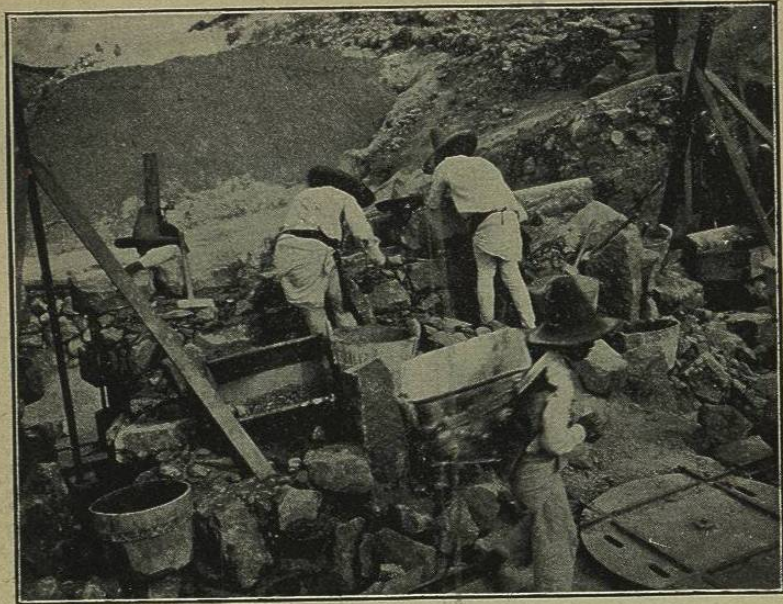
MASONS AT WORK ON THE SAN JOSÉ DAM, MEXICO.
